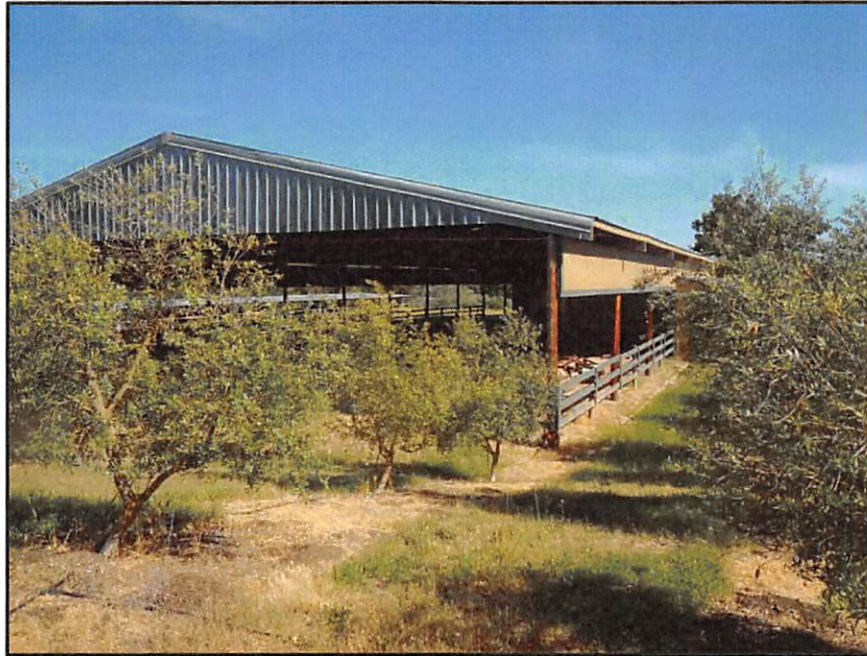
View of proposed Site 1, where existing barn structure to be replaced or retrofitted to support a greenhouse for indoor cannabis cultivation, view east. (May 10, 2018).
